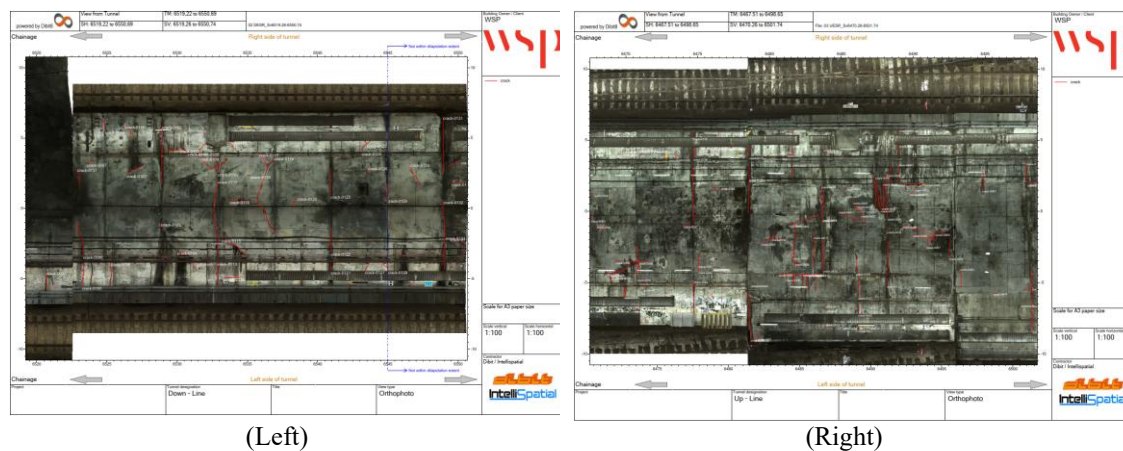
Plan layout of tunnel dilapidation survey results. (Left) Down Track tunnel. (Right) Up Track tunnel. Annotated defects mapped using AI-assisted 3D scanning.
